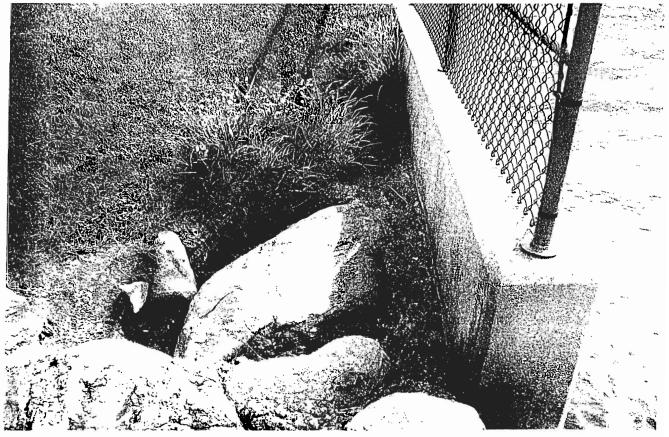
View of left retaining wall upstream of the tainter gate. Not minor crack separation Photo 6 - View of upstream end of left retaining wall. Note erosion working its way behind wall
